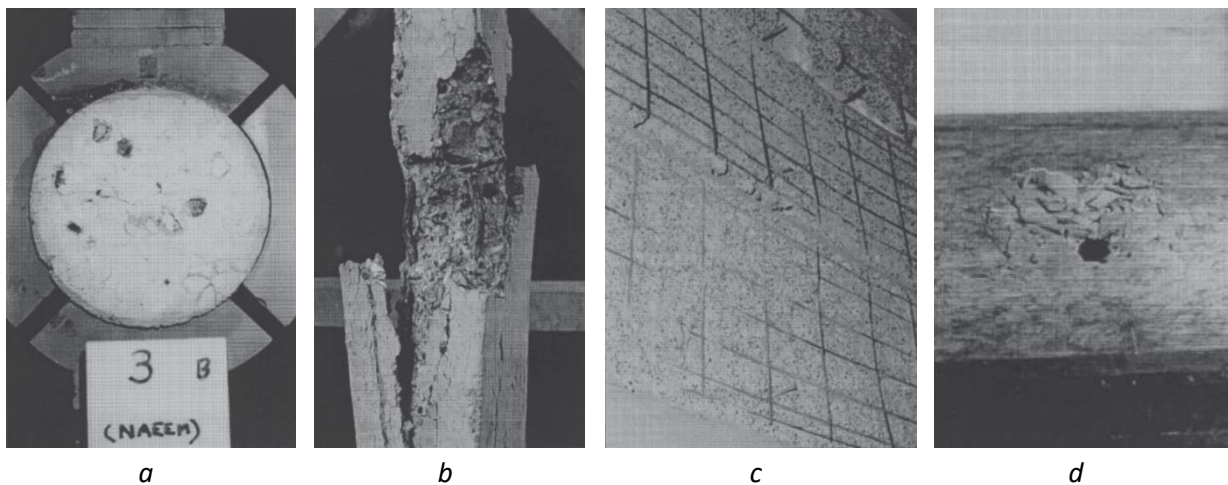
| Four different categories of concrete spalling, from left to right: aggregate spalling, corner spalling, surface spalling, and explosive spalling [65]
